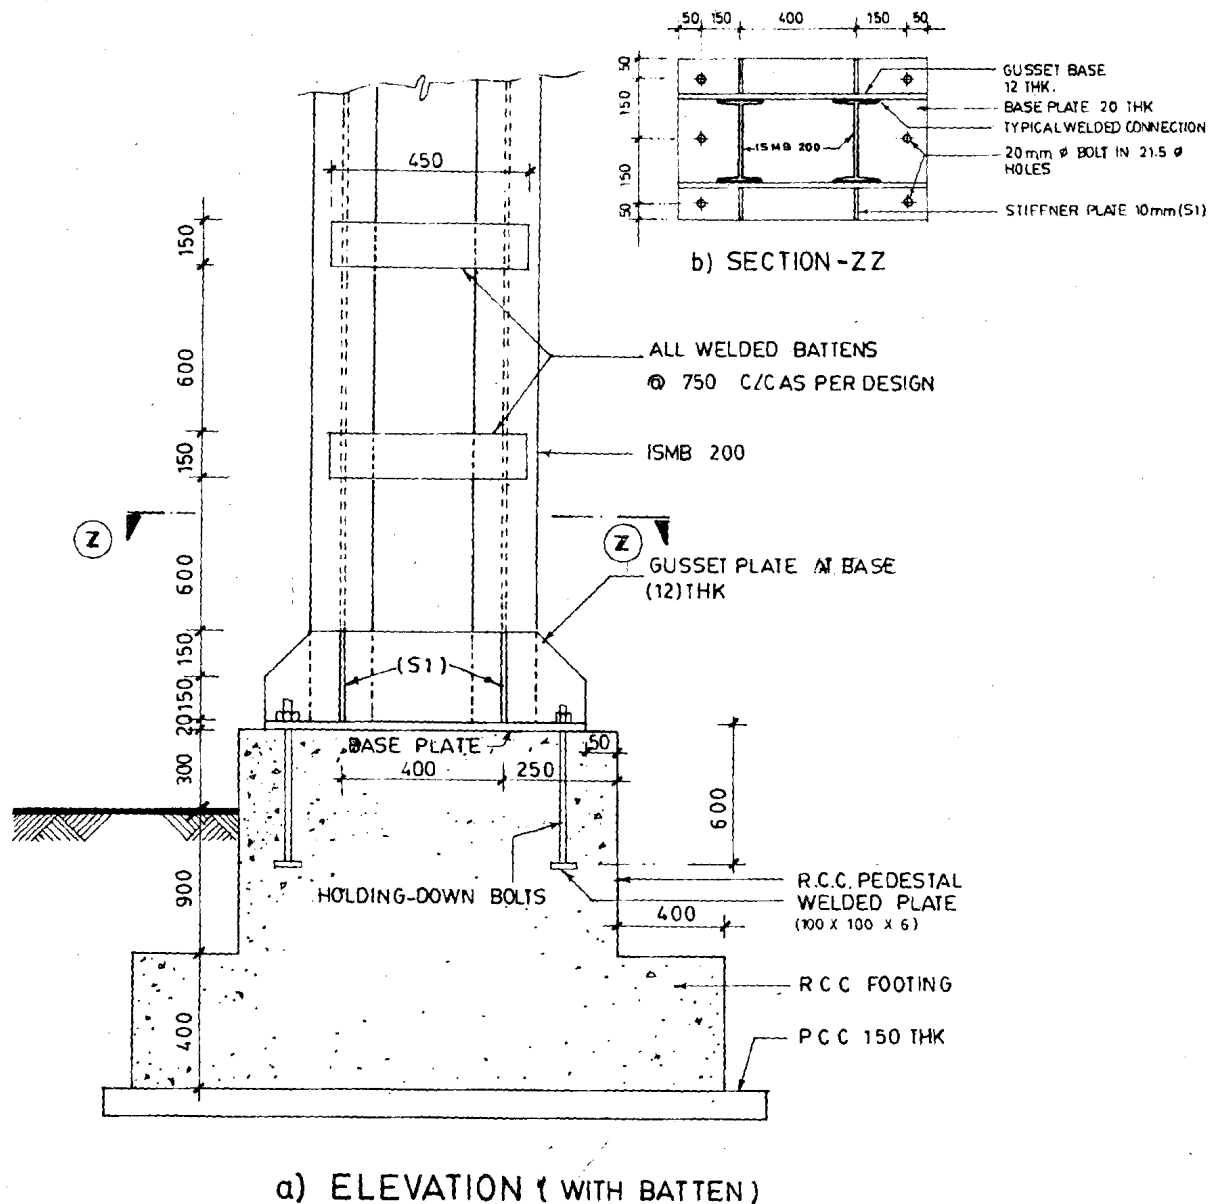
(a,b) : Two-legged Braced Column with Base Connection to R.C.C. Footing
